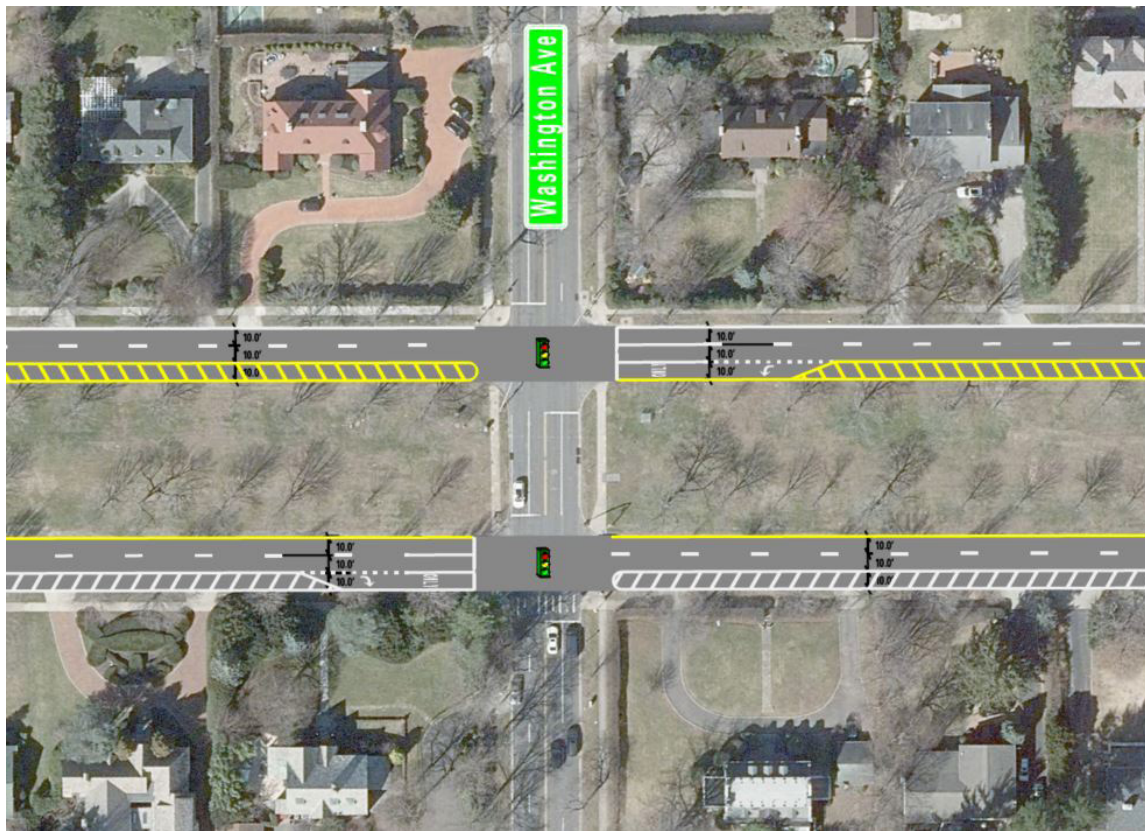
Road Diet at Washington Avenue Intersections
